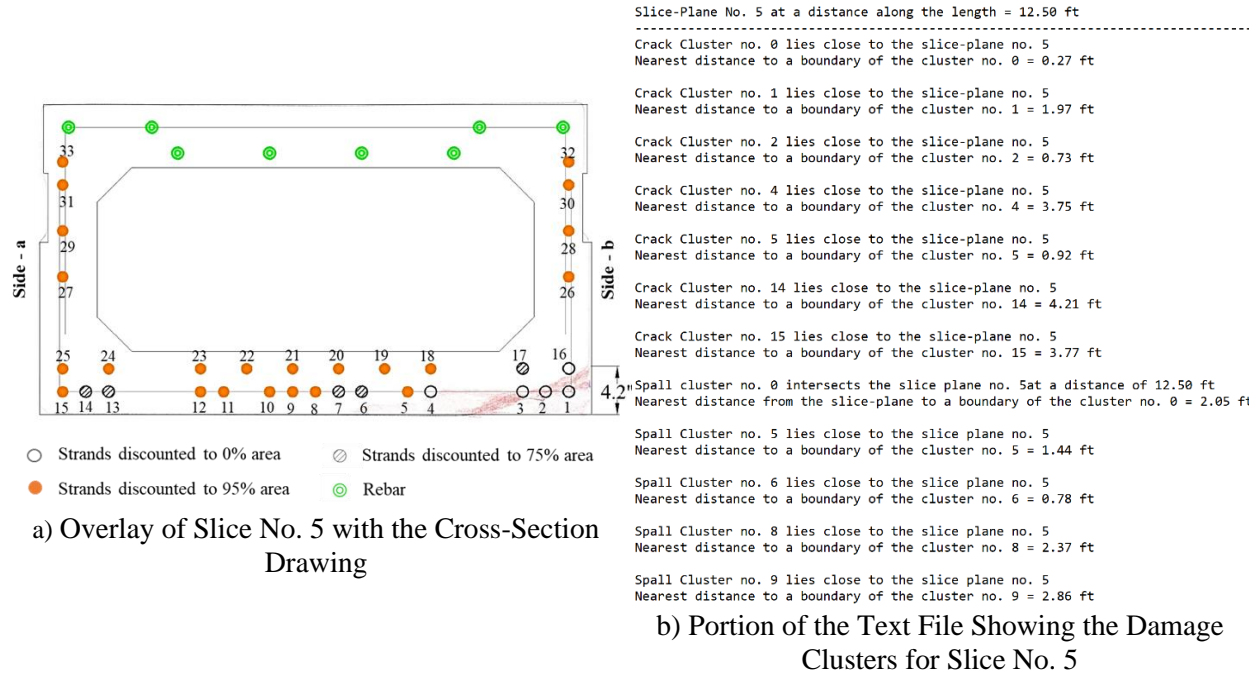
Tools for Strength Estimation at Slice-5 on Aden Road Bridge Box Beam-3
